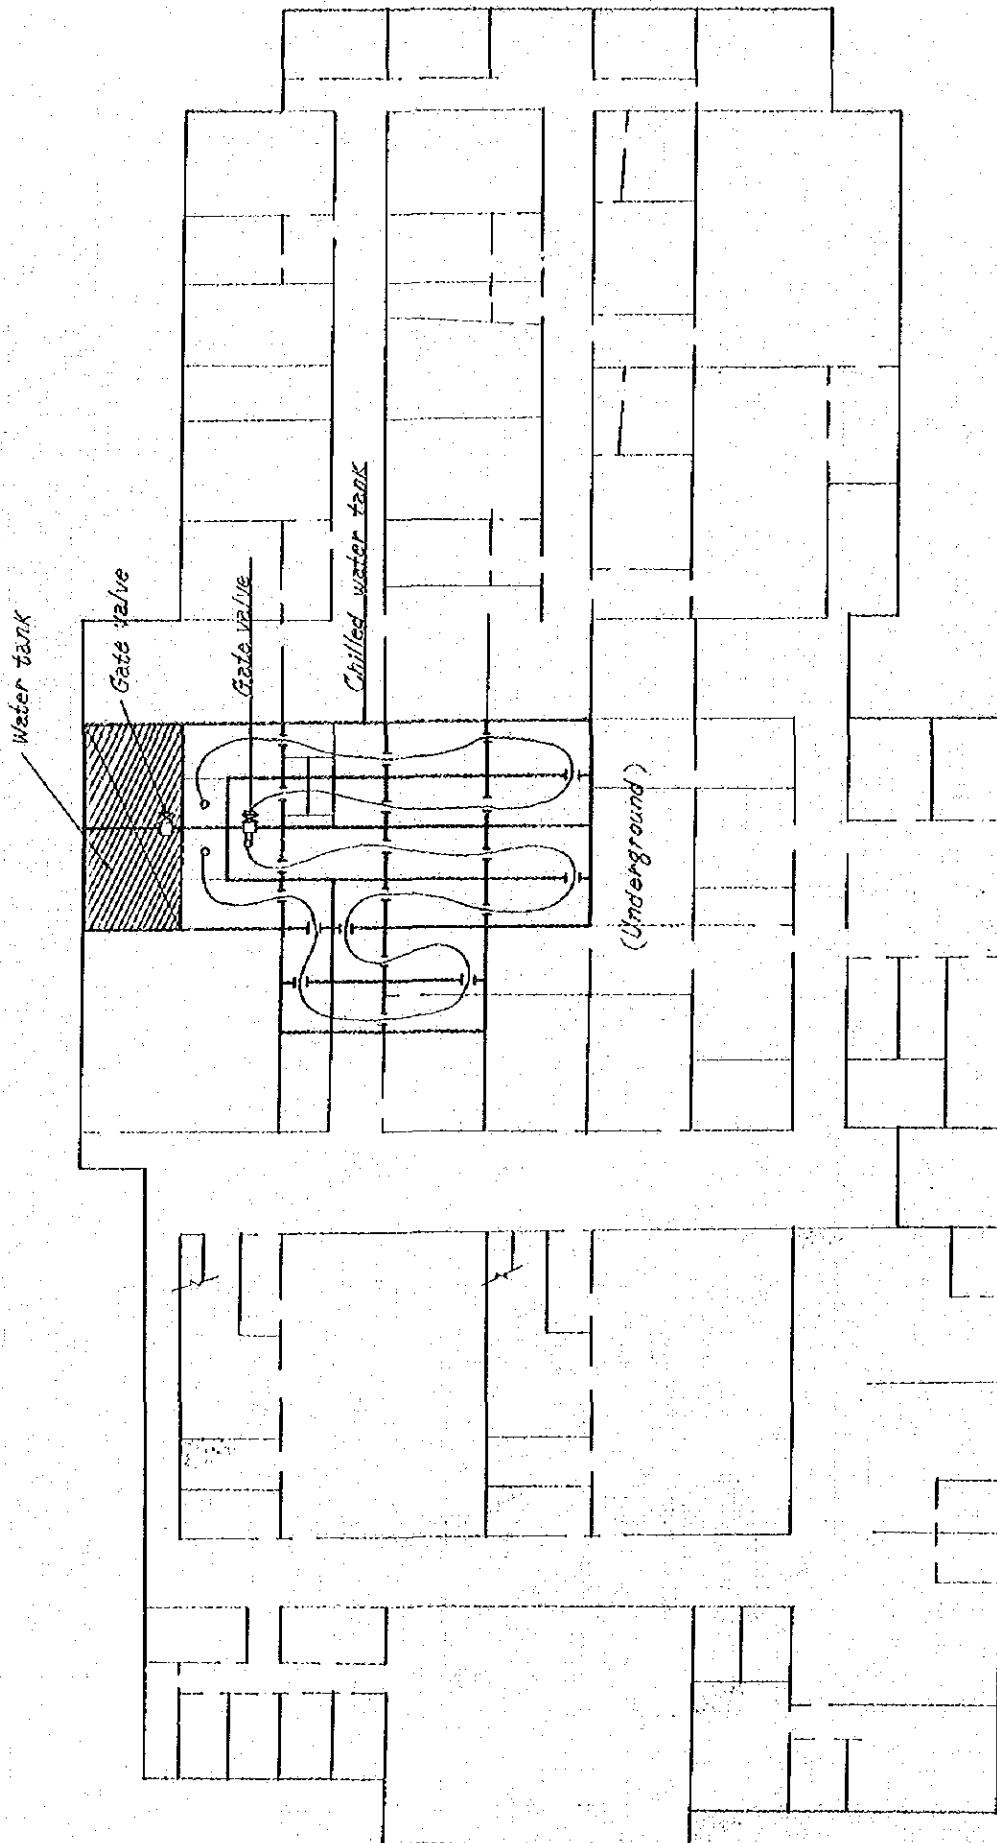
WATER TANK & CHILLED WATER STORING TANK LAYOUT
